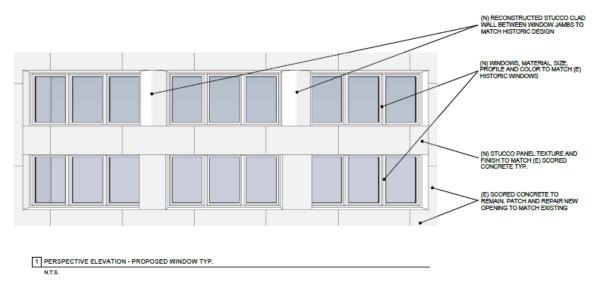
Detail of row of three new windows at the east and south façades. Quezada Architects, "Amy's Kitchen: Site Plan & Architectural Review" (May 6, 2022), SPAR-202.
